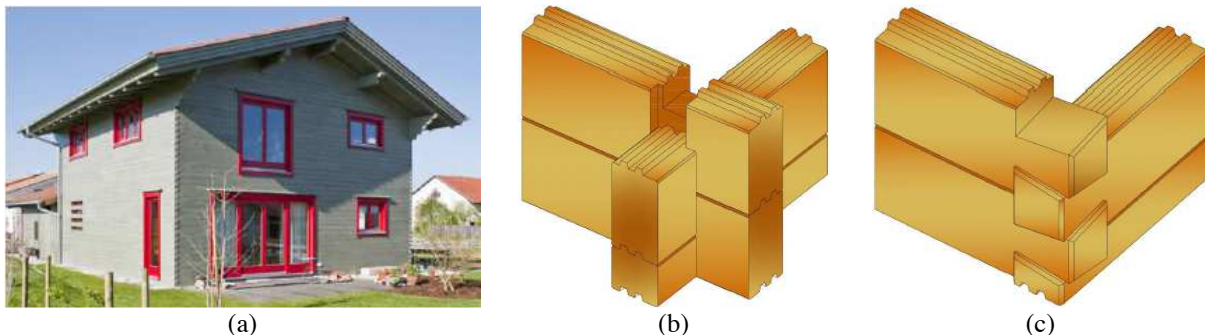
(a) example of log-haus residential building, with detail of typical (b) ‘Standard’ and (c) ‘Tirolerschloss’ corner joints at the interception between orthogonal log walls (www.rubner.haus.com).
